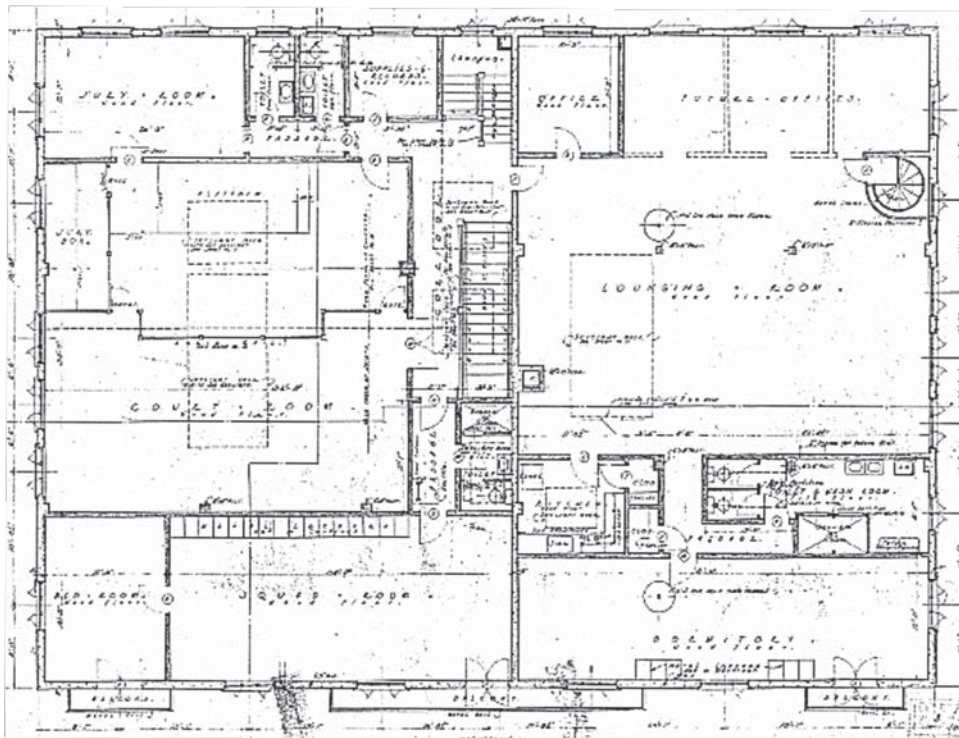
Original architectural drawings by Birge Clark, second floor. The left side of building housed the police department quarters, and the right side the fire department quarters (Source: Avenidas drawing file).
